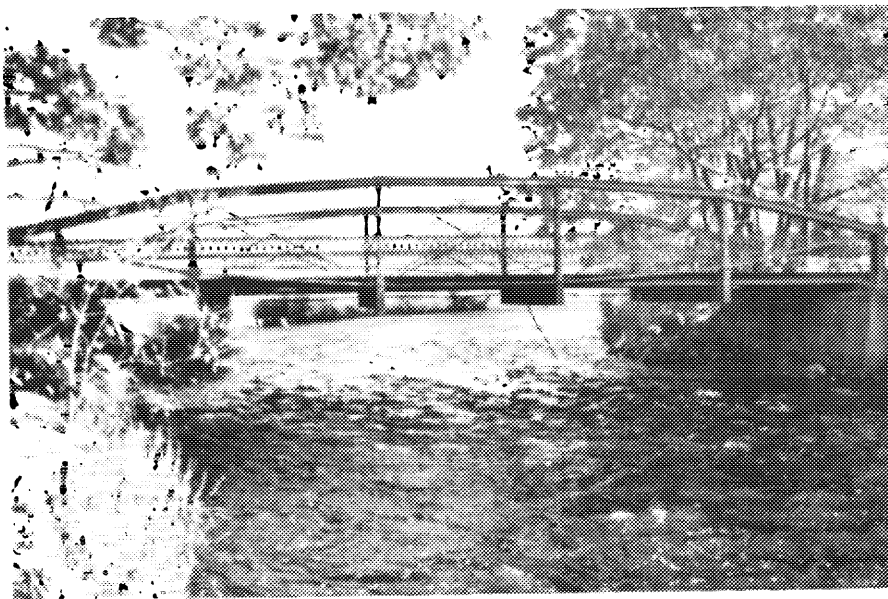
Gilbert Road Bridge showing low clearance and channel condition. Mile 12.3.
